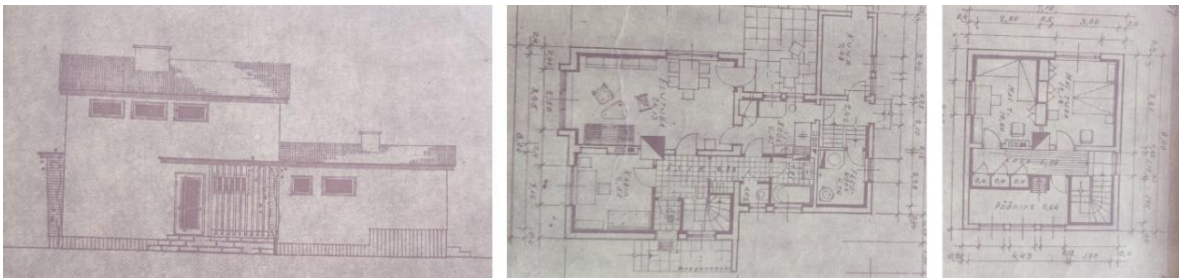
Project 67, an example of a partly two-floored dwelling from 1965 (left to right: elevation; ground floor; upper floor) (RPI Estonprojekt, 1965)
